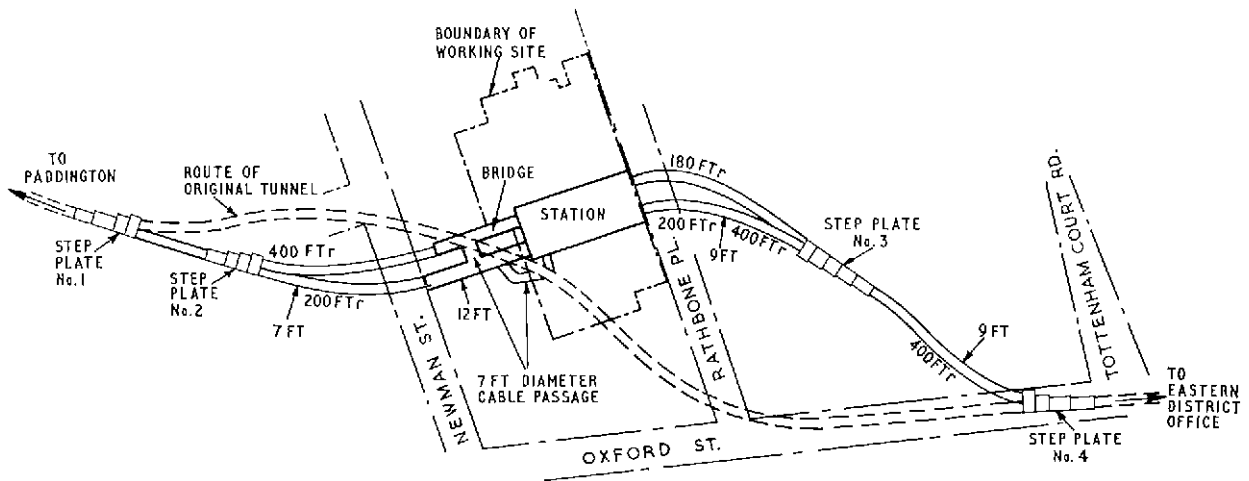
NEW WESTERN DISTRICT OFFICE POST OFFICE RAILWAY TUNNEL LAYOUT
